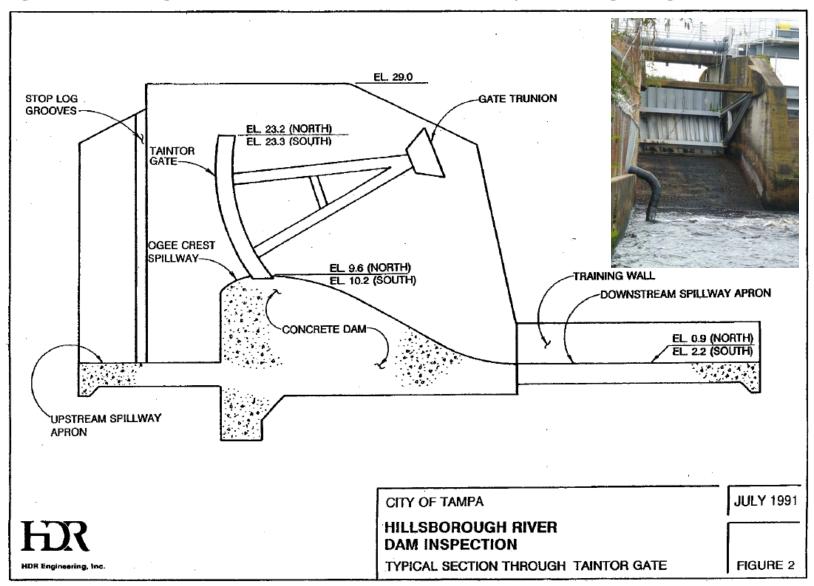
Hillsborough River Dam Cross Section – Concrete Gravity Dam through crest gate
